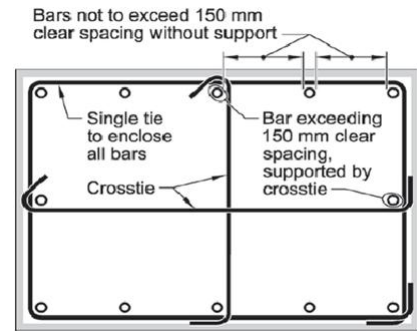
Details of laterally supported column bars and tie anchorage in ACI 318M-14 [15]
